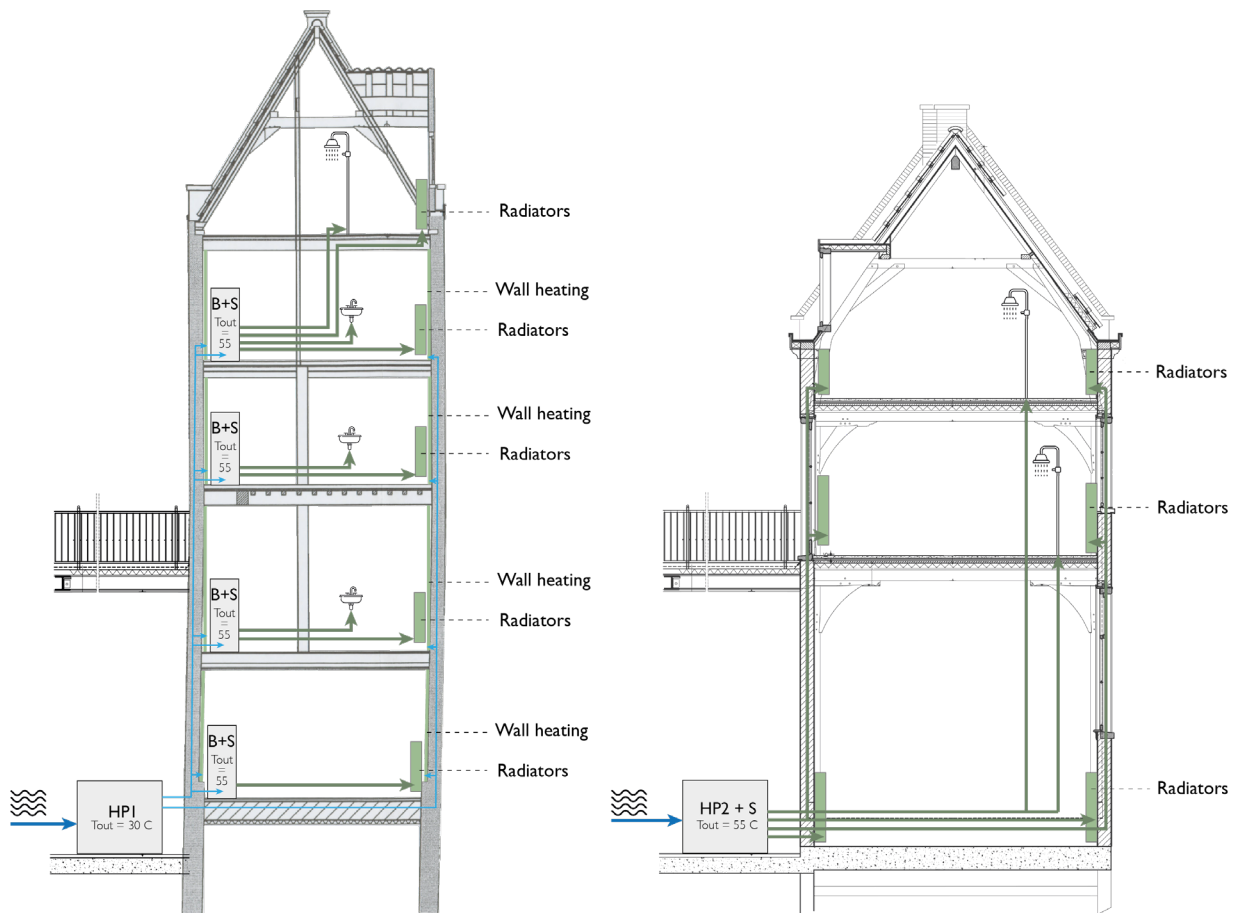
Proposed heating & DHW design of the front & back house. Adapted from Stadsherstel, 2005.
